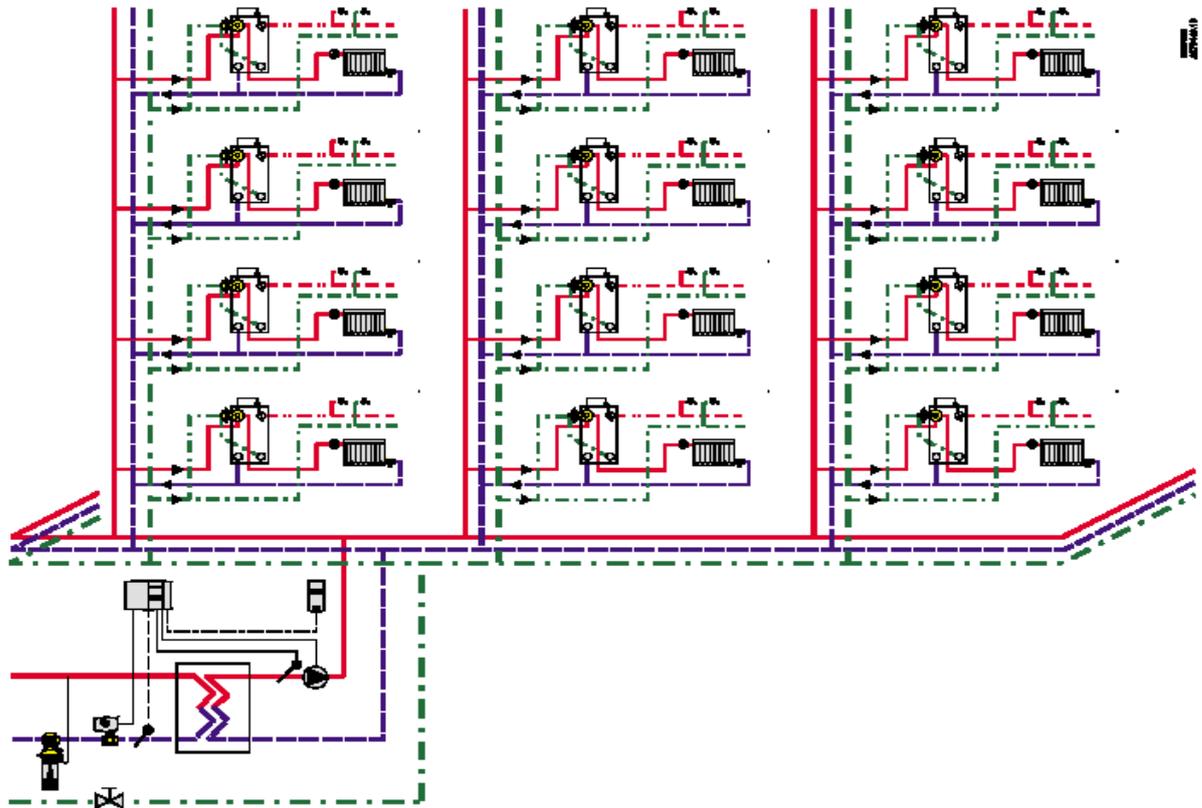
Example of district heating system connection in a high rise building (Illustration: Danfoss).
